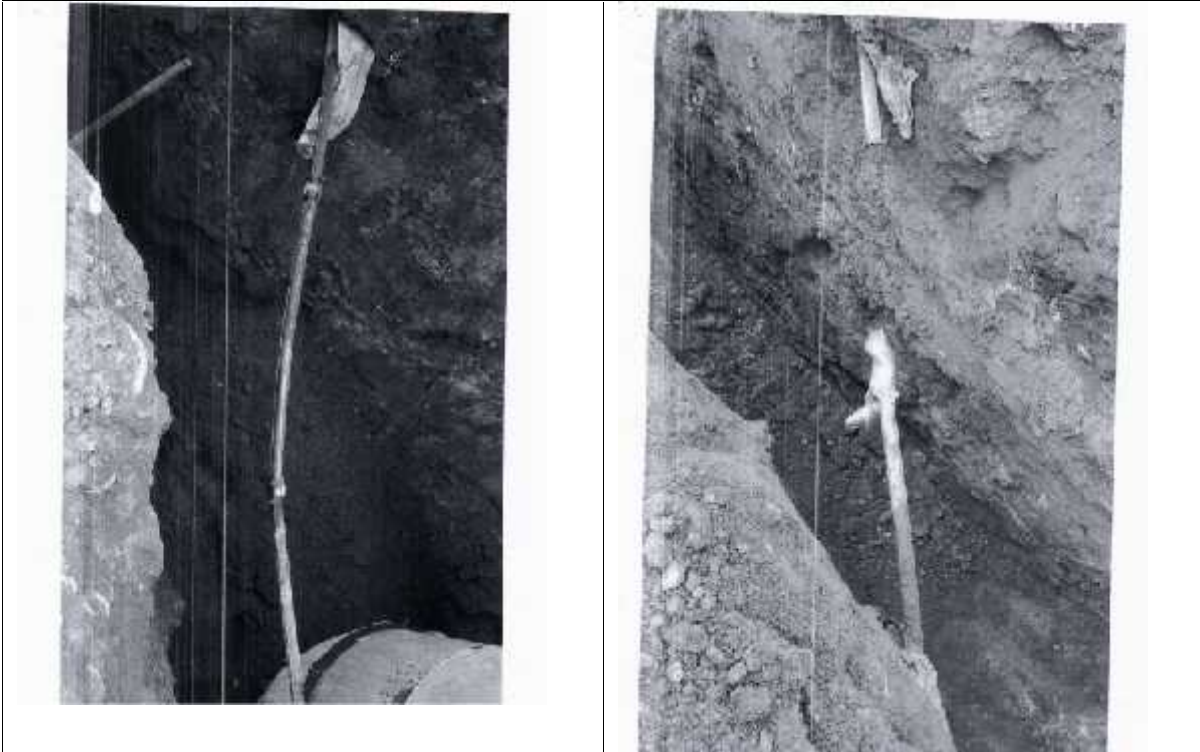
Damaged underground infrastructure and the same section after rehabilitation – Ninoshvili Str.
